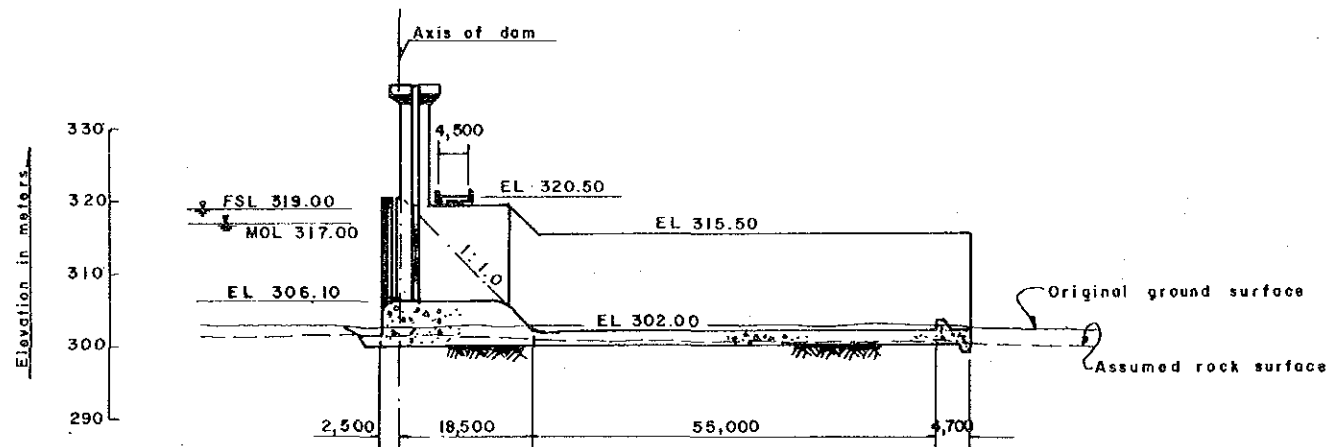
SALTO PILÃO (I) HYDROPOWER SCHEME, GENERAL PLAN OF DAM AND INTAKE
